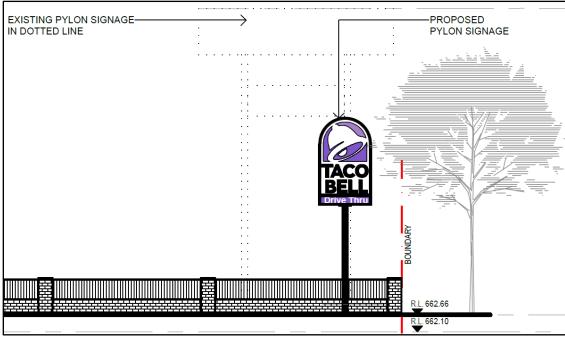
Elevation Plan – South-Western Elevation – Height, Bulk and Scale of Existing Signage Located on Lot 5 DP 1086710 vs Proposed Pylon Sign (No. S01)
